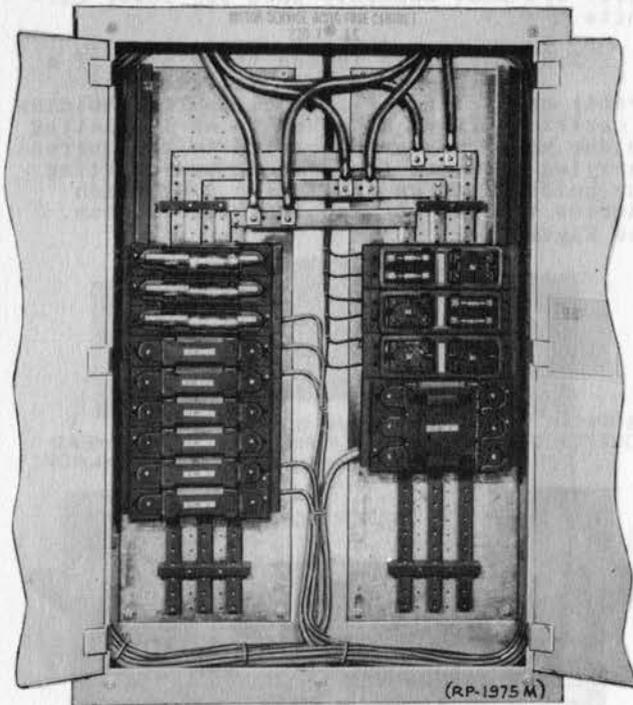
SAFTOFUSE CABINET WITH WIRING GUTTER COVERS REMOVED
